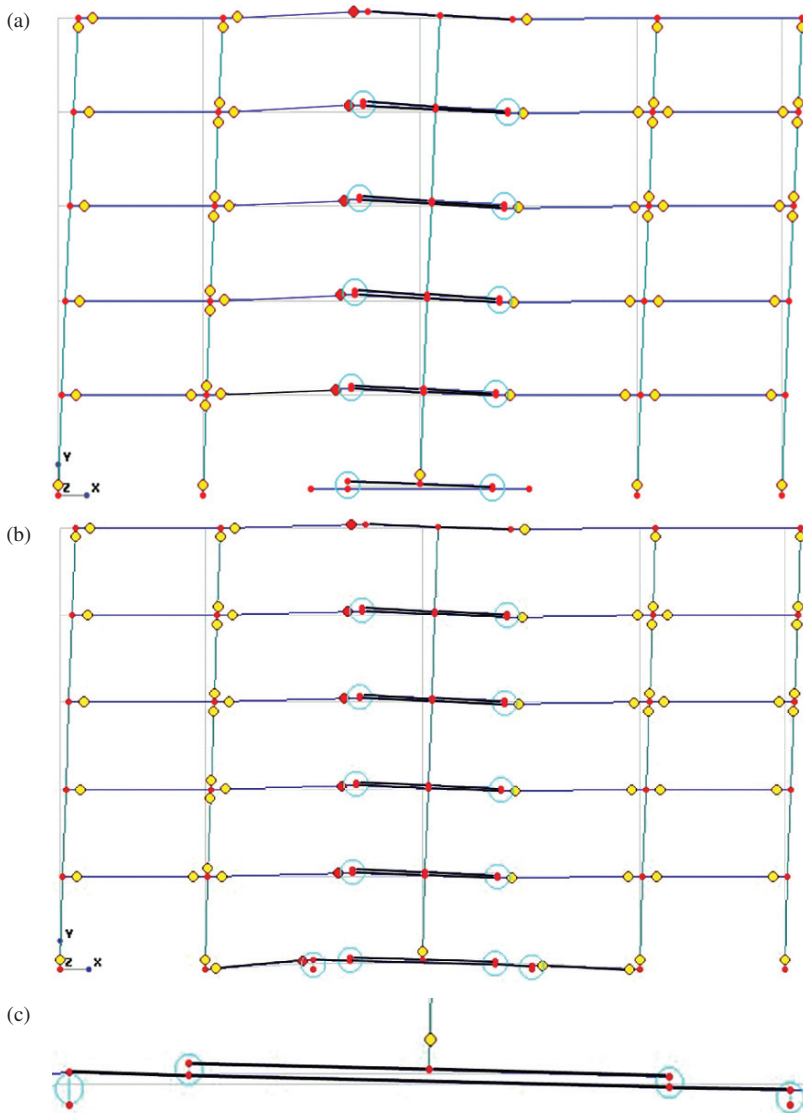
Deformation and plastic hinging in retrofitted frame from nonlinear static analysis: (a) wall fixed at the base; (b) wall footing connected to tie-beams and uplifting; (c) detail of (b) at the base of the wall and the footing (yellow circles: plastic hinges; larger red circles: flexural failure) (See also Figure 6.9 on page 674)
